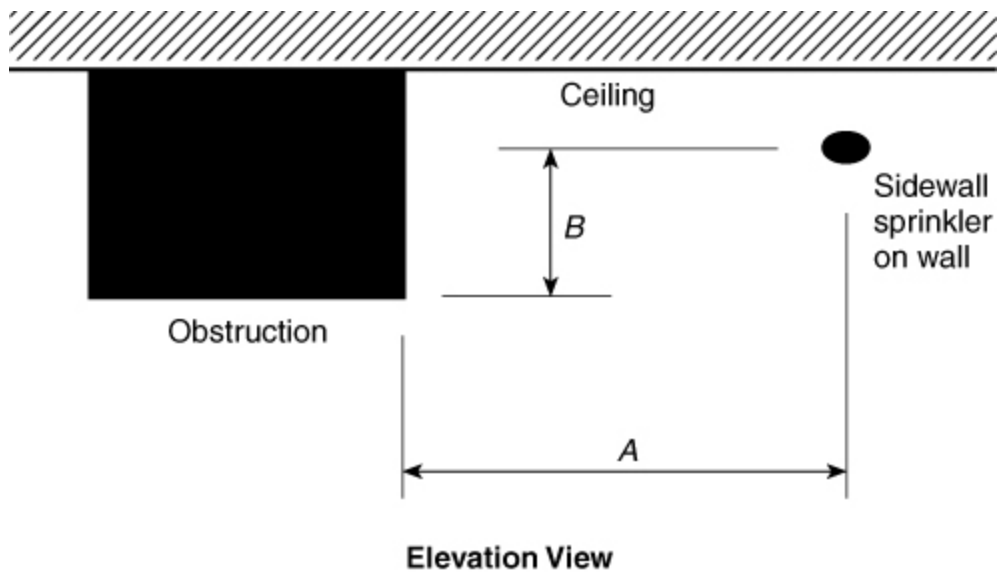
(b) Obstruction Against Wall (Extended Coverage Sidewall Spray Sprinklers).
